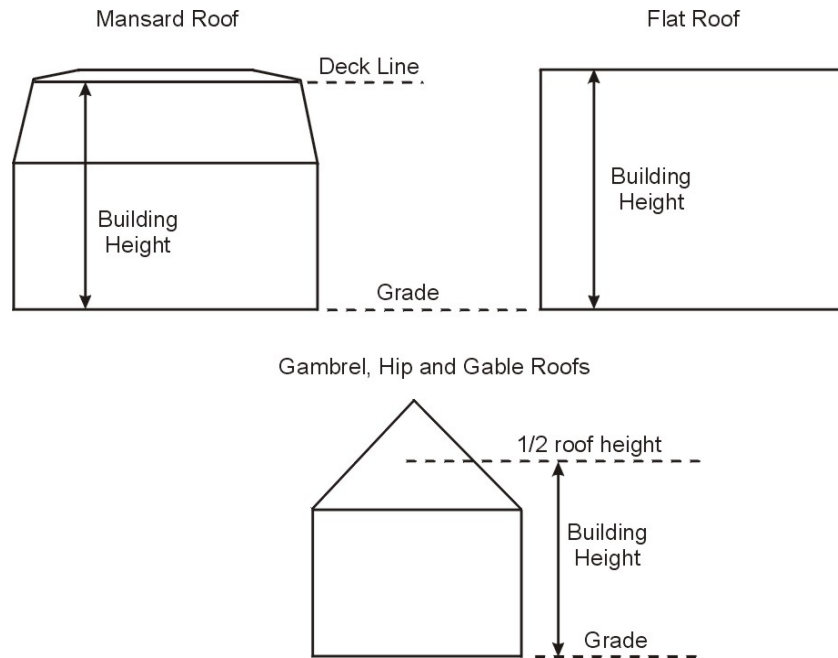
Measurement of roof heights based on the type of roof.
